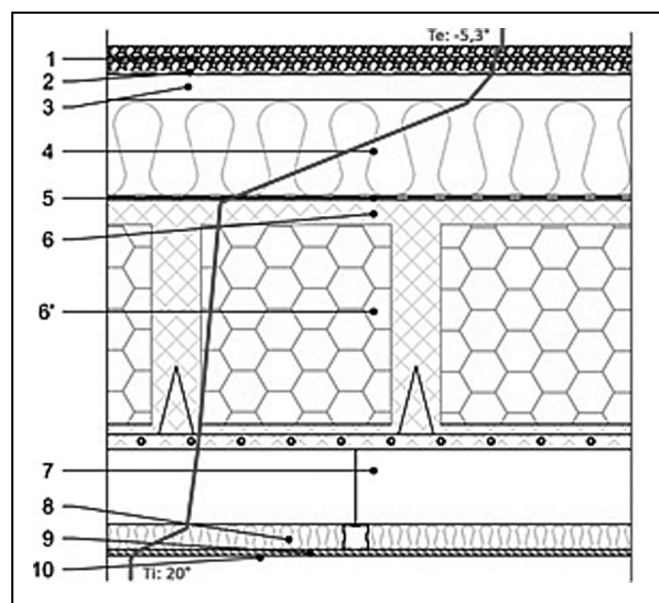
Stratigraphy of the roof with lights less than mt. 9,5 of the technological solution with a structural mesh in reinforced concrete and brick masonry
